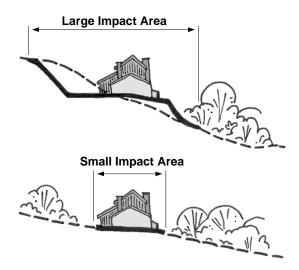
Flattening Steep Slopes for Building Sites Uses More Land Area Than Building on Flatter Slopes (Source: MPCA, 1989)
